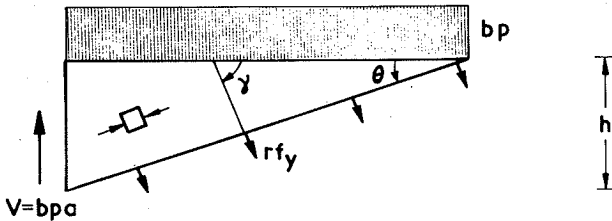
End zone of beam with inclined stirrups, bounded by section parallel to concrete compression
